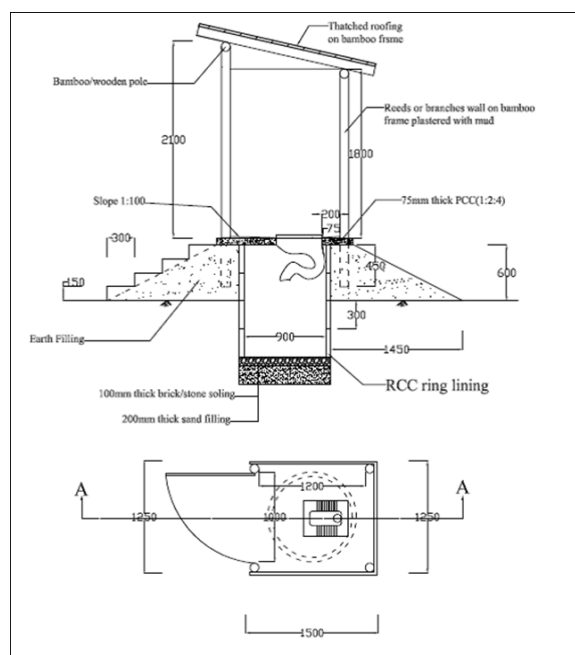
Water seal direct pit of RCC lining and plan (source: DWSS)
